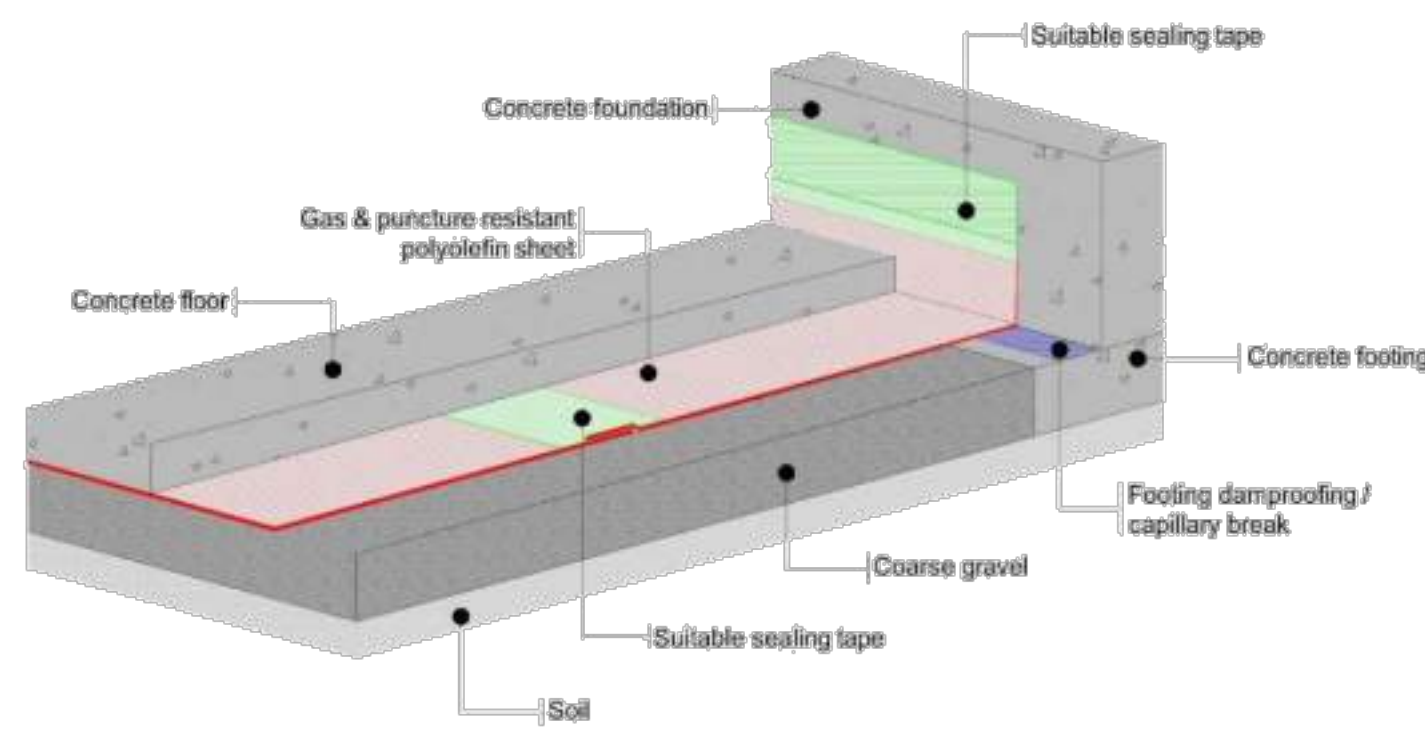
Sealing sub-slab membrane vertically to concrete foundation wall
